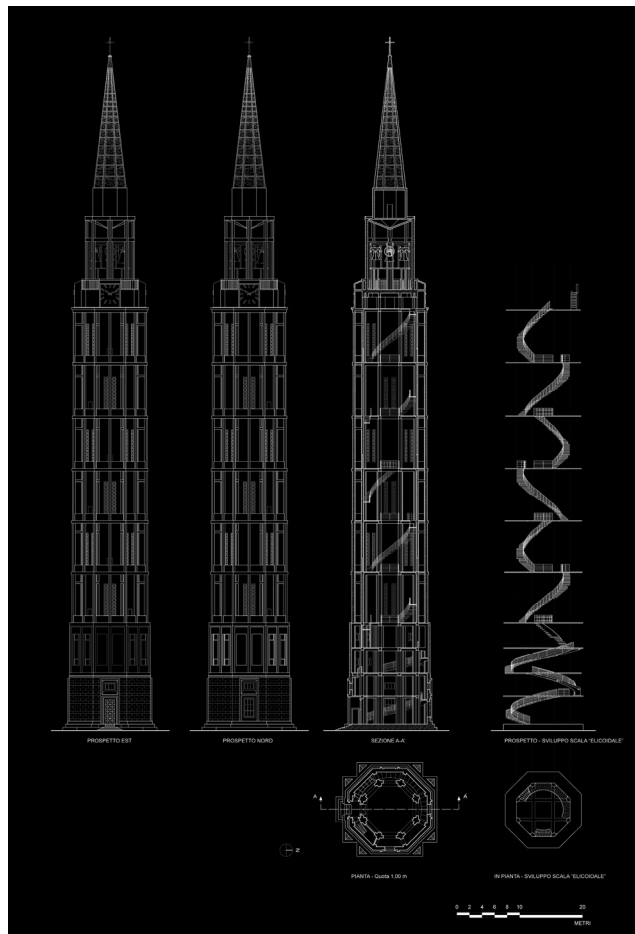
Floor plans, elevations, section and scale development of the bell tower. Graphic elaboration by Mohamed El Ouajajy.
